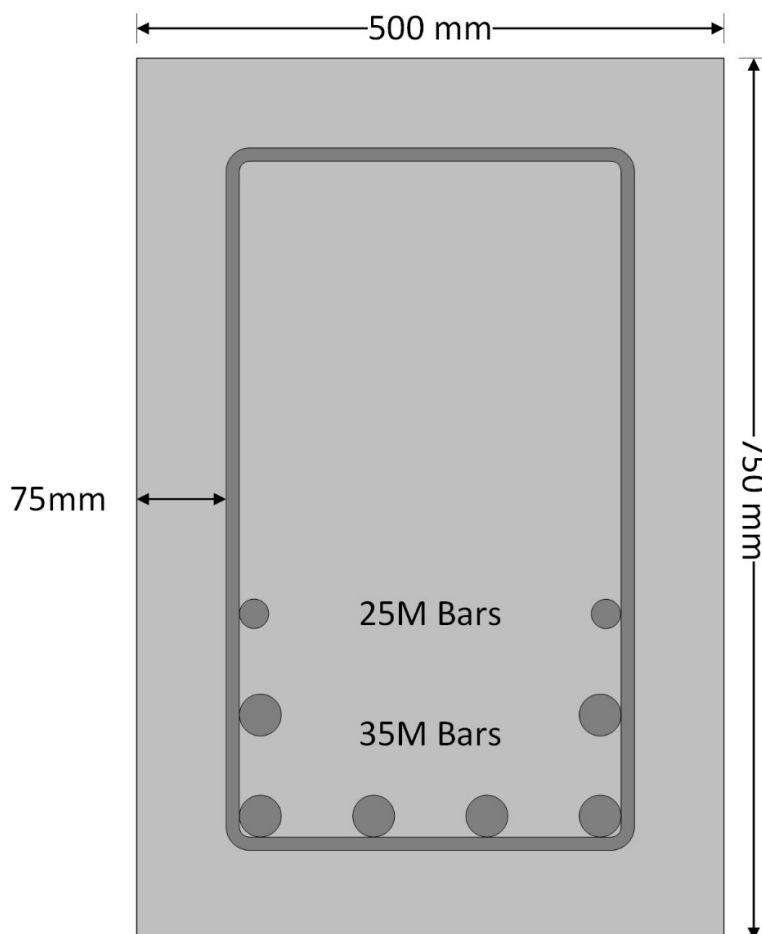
Under-Reinforced Beam Cross Section assuming 400 MPa steel reinforcing bars
